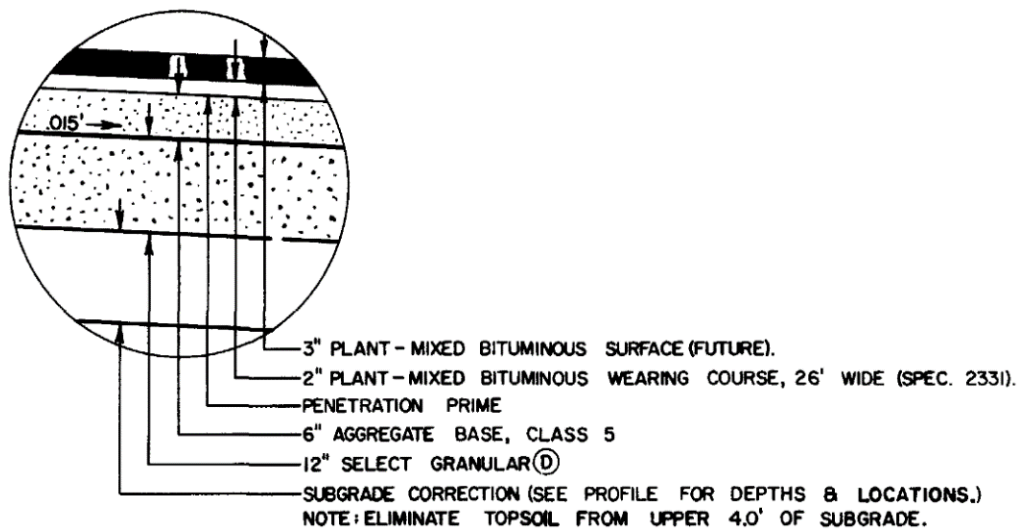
TH 61 mainline typical section (1969 construction plan)
